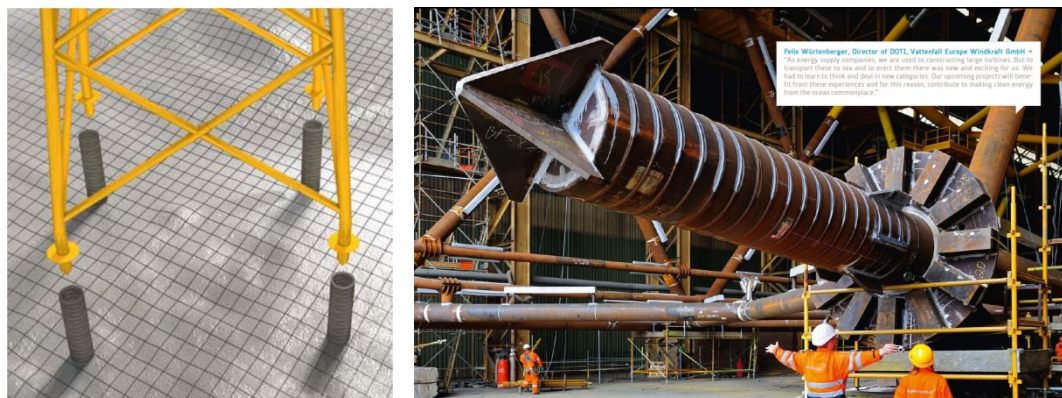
Example of grouted male stab connections to pre-driven piles (OWEC tower)
